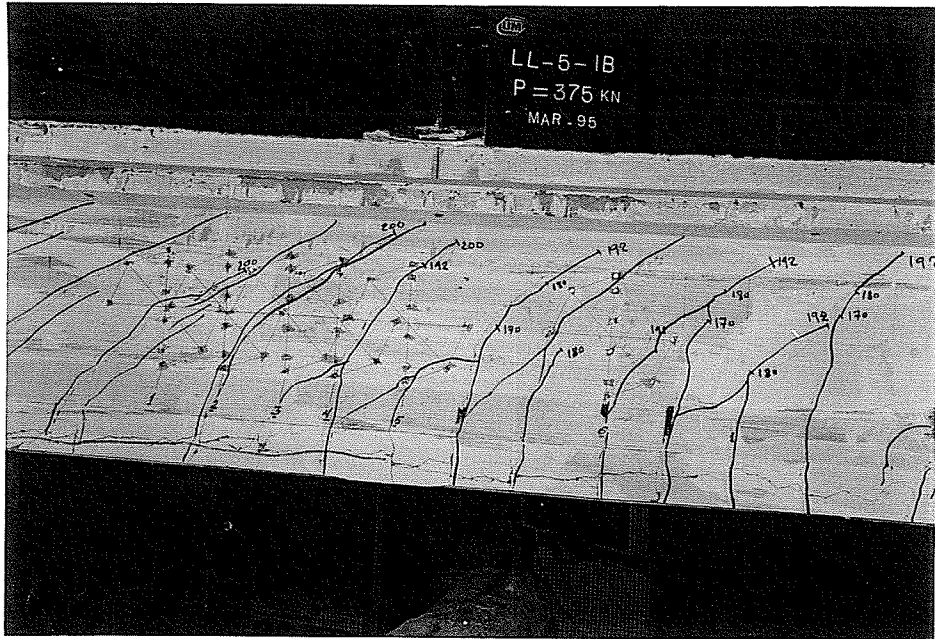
(e) Diagonal crack pattern of beam LL-5-1B
